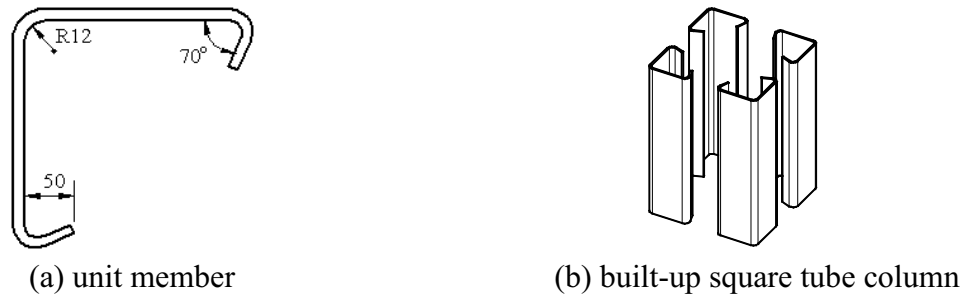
ACT (Advanced Construction Technology) Column (Choi S.M 2011)
